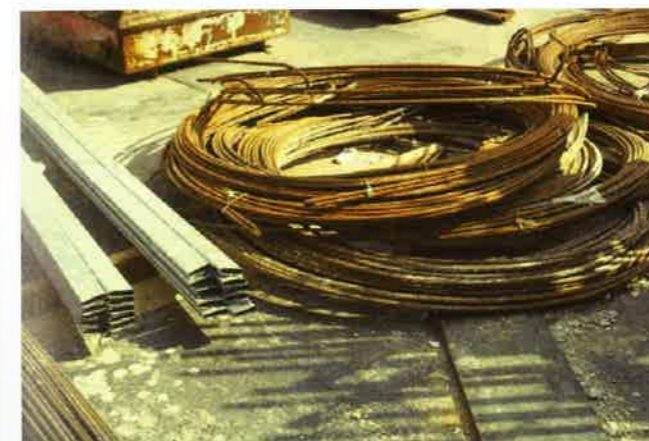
A-2 Bare Strands and Ducts Are Delivered to the Site for Tendon Preparation (P169)
